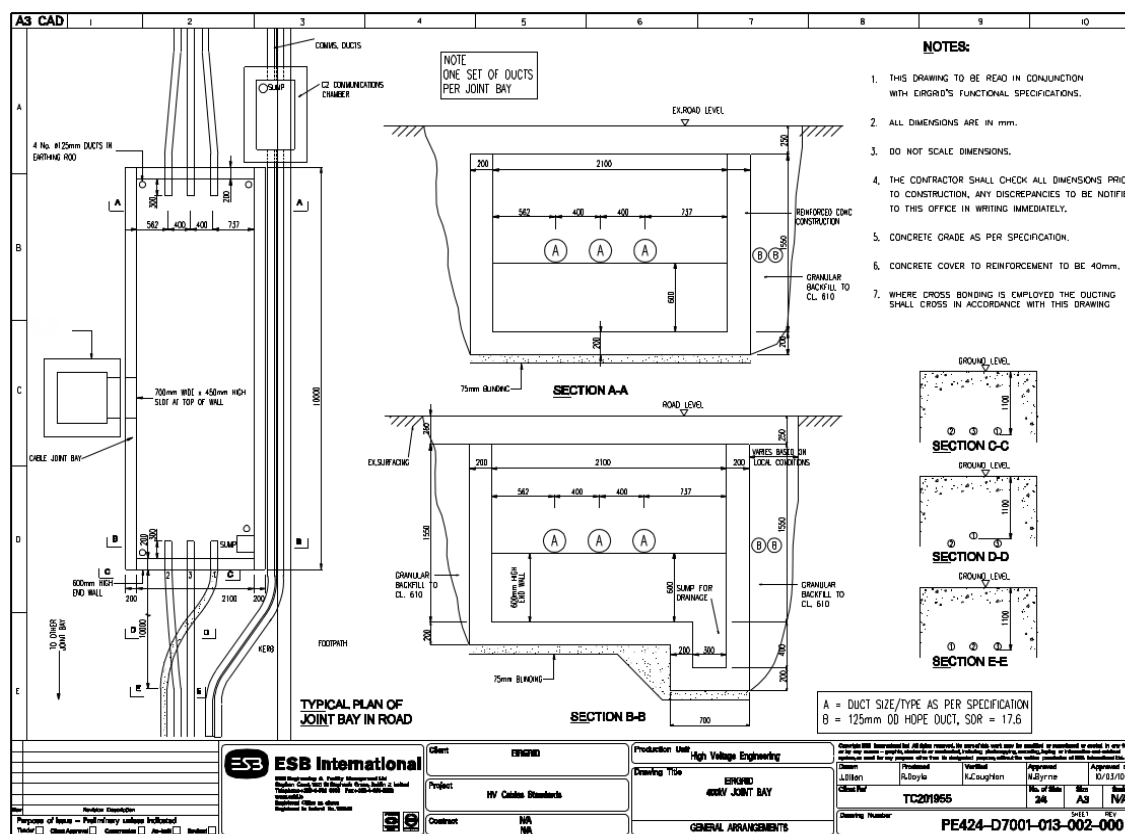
400kV Single-Circuit Joint Bay Layout
